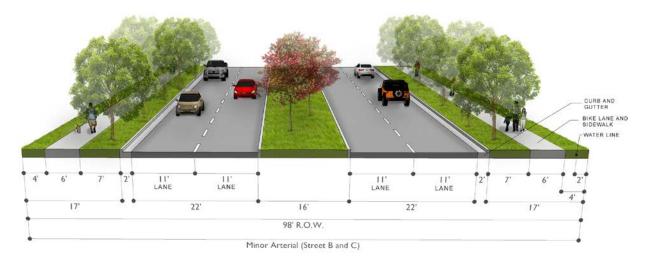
Cross Sections – Minor Arterial w/Bike Lanes
